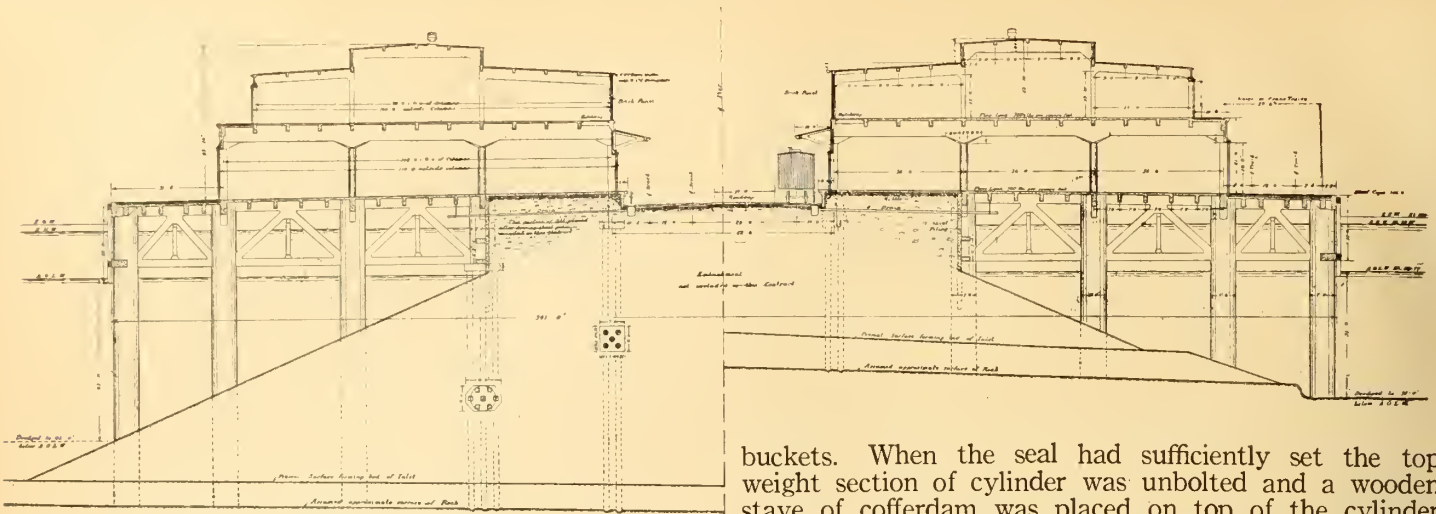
Ballantyne Pier Cross-sections at Outer Berth West Side and Inner Berth East Side.
